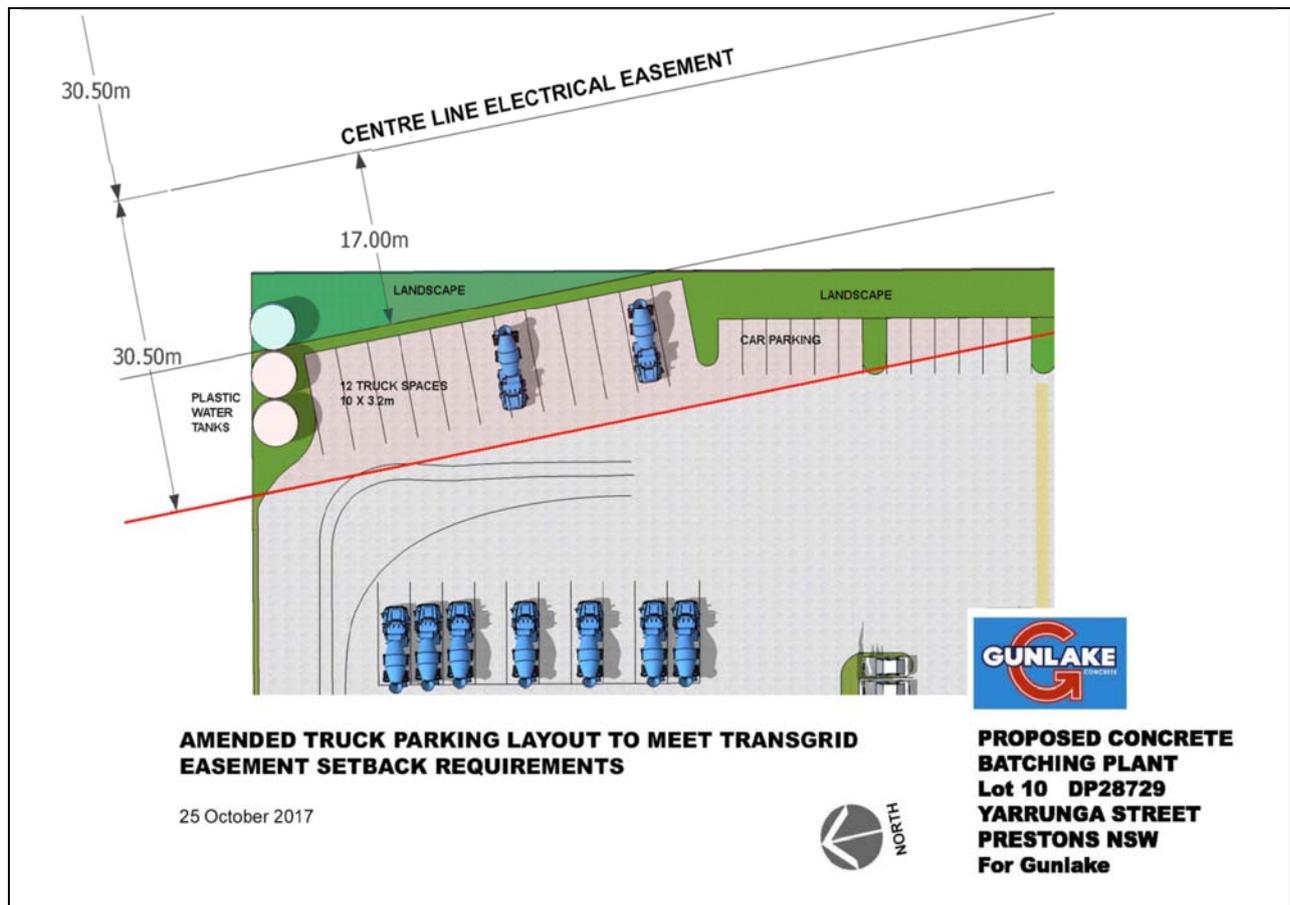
Amendment to truck parking layout proposed to provide required separation to the electrical easement in the south-eastern corner of the site.
